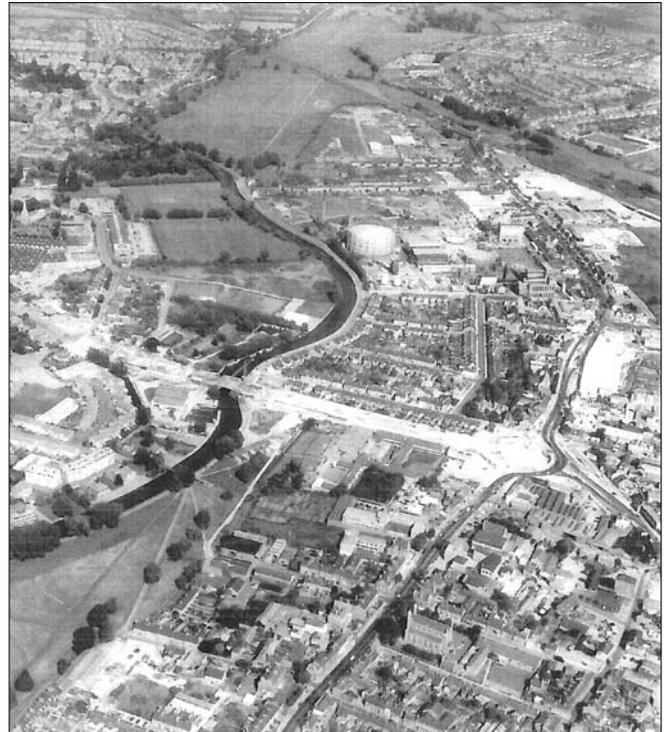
(top) and Figure 10 (above): Photographs showing the construction of Elizabeth Way Bridge in 1971
